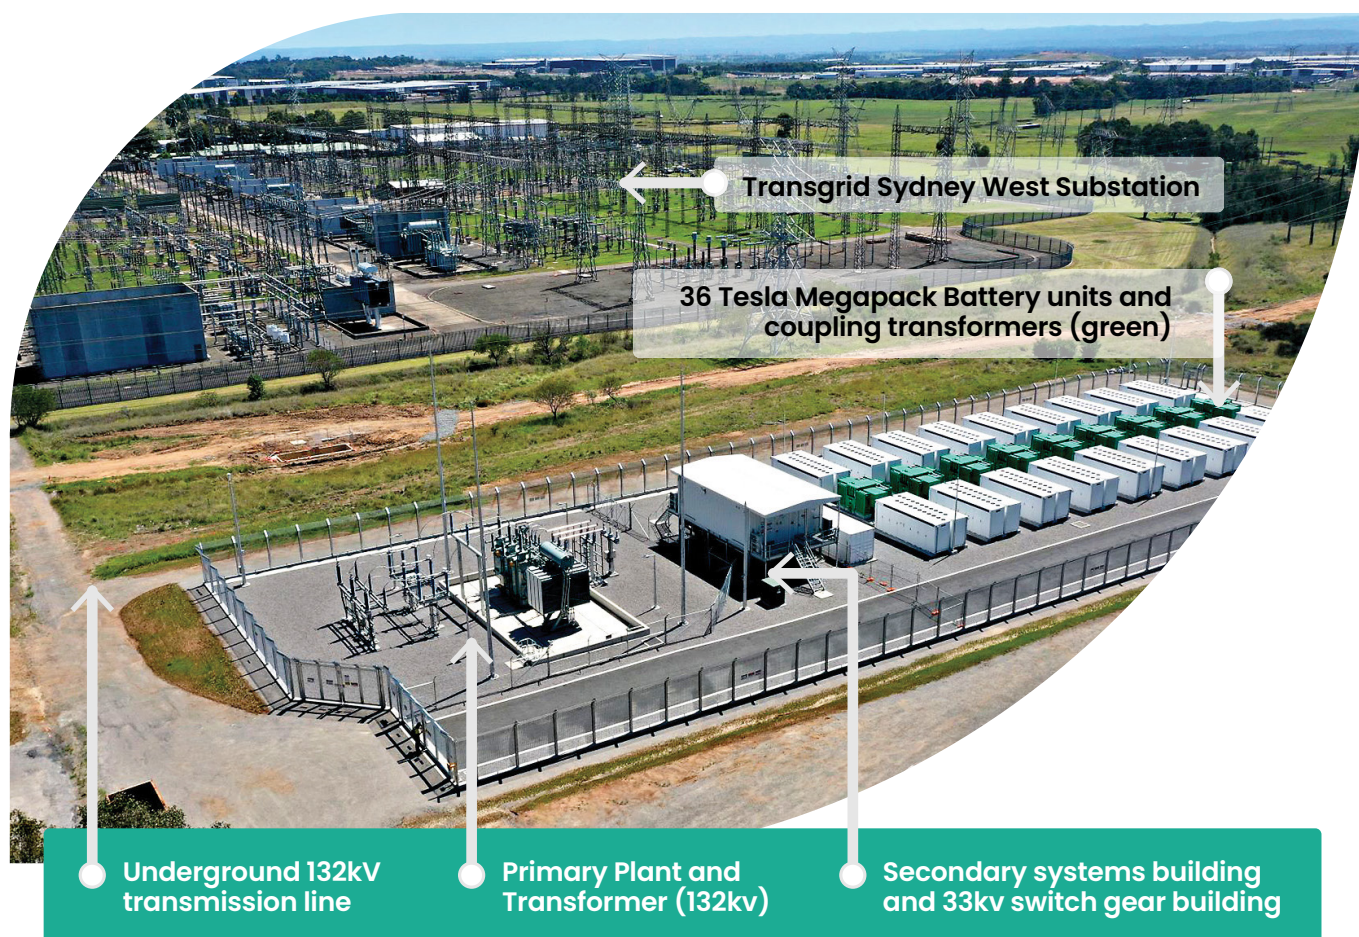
Wallgrove Grid Battery and Sydney West 330/132kV Substation aerial view
